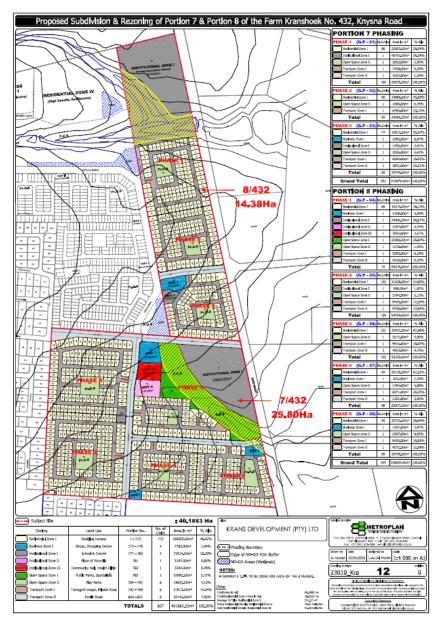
Original Conceptual Site Layout Plan (Alternative A: Option 1) as per Appendix C2 of the Scoping Report.
